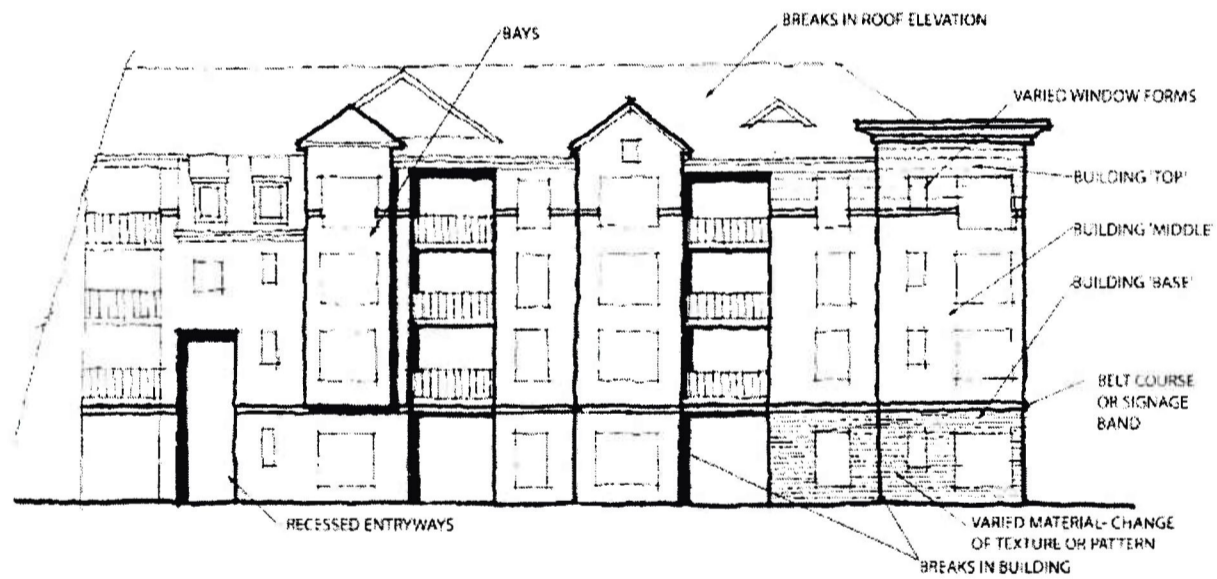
Multi-Family Design Features – Vertical and Horizontal Building Articulation
